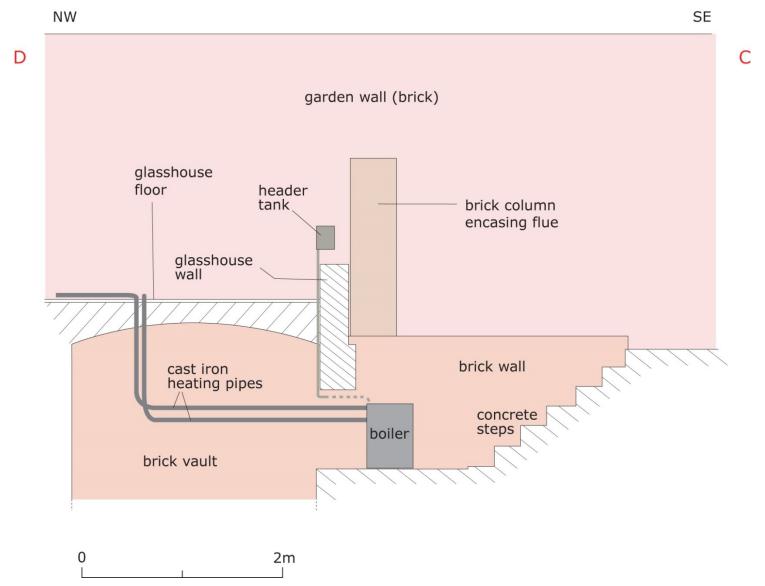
Elevation drawing through the boiler house of Glasshouse 1. Location of the elevation shown in Figure 9.
